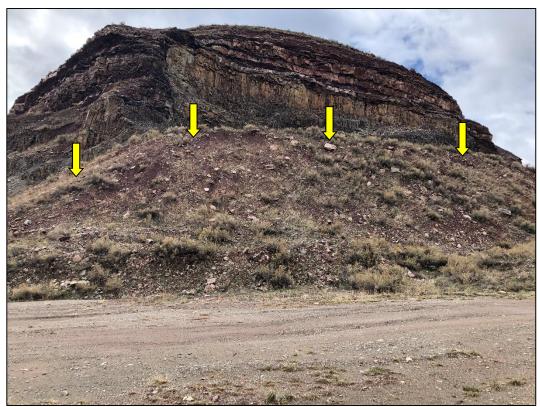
View looking south at northwest-facing highwall that exists between the two quarries. This highwall was partially backfilled (indicated) in the early 2000's during construction of the Quarry 2 access road ramp (road visible in foreground). In TR-5, the operator proposes constructing a rockfall catchment berm and chain-link fencing along the top of this backfill.
